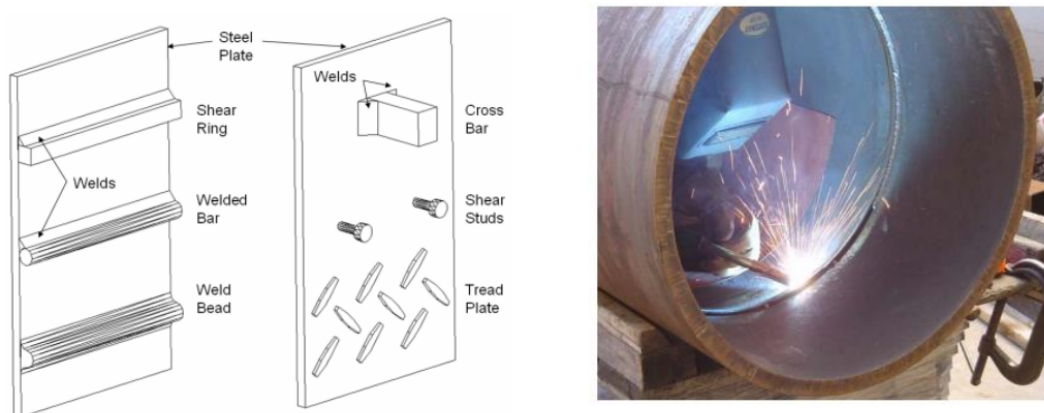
Typical designs in which a connection must be realized between the steel pipe pile and the concrete pile cap (Kidwell et al. 2018).
